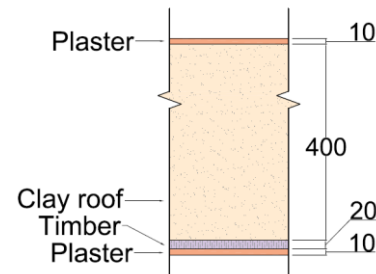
M4 roof cross-sectional detail. All dimensions are in millimetres.
